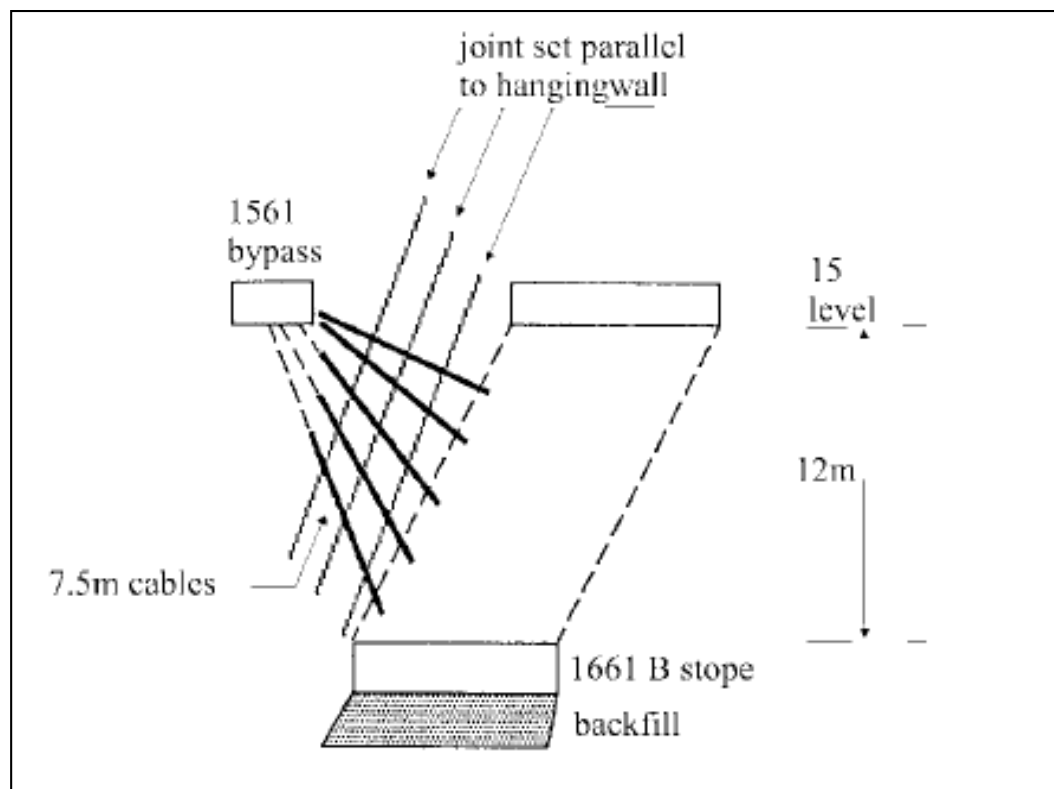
Support installation to support hangingwall parallel bedding / joints (Brady & Brown, 2006)
